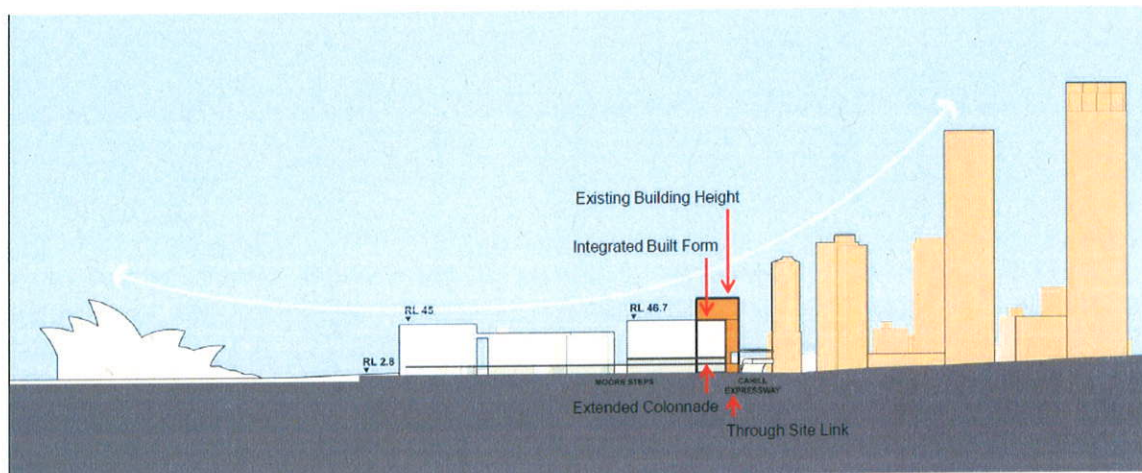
Contextual elevation showing the height transition to city buildings (Source: Proponent's Design Report)
